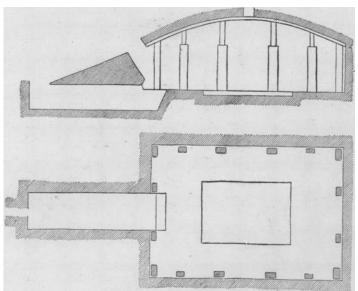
Plan of an Underground House, Nu'nligren. (From a sketch.)
